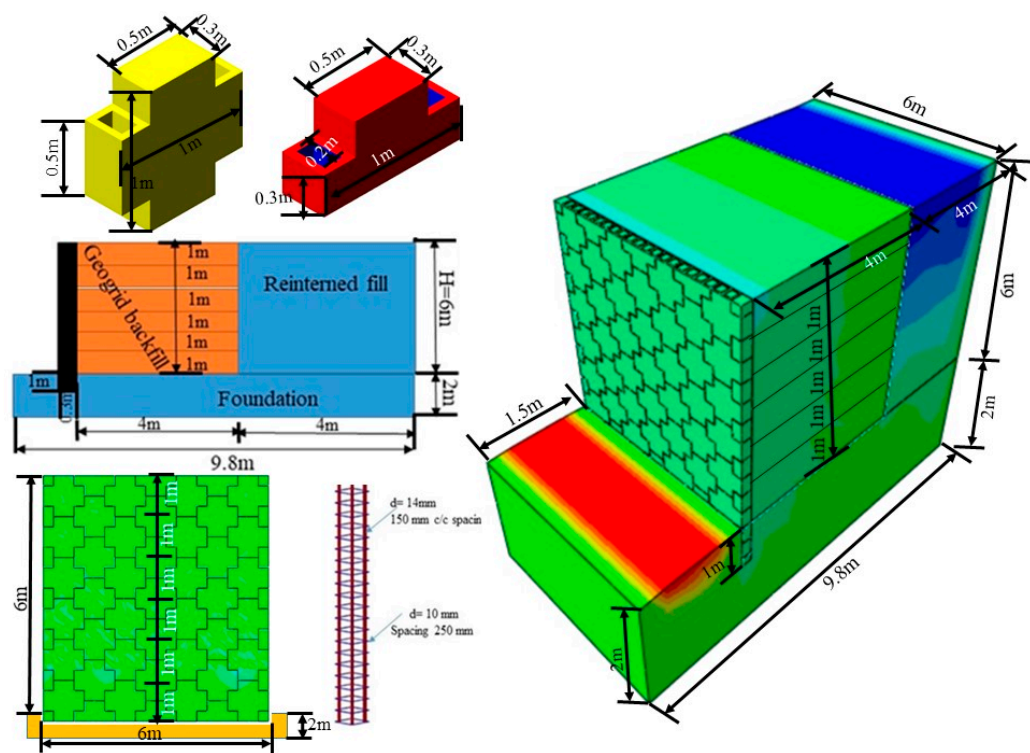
A 3D model overview and precast hollow concrete MSE wall structural components.
